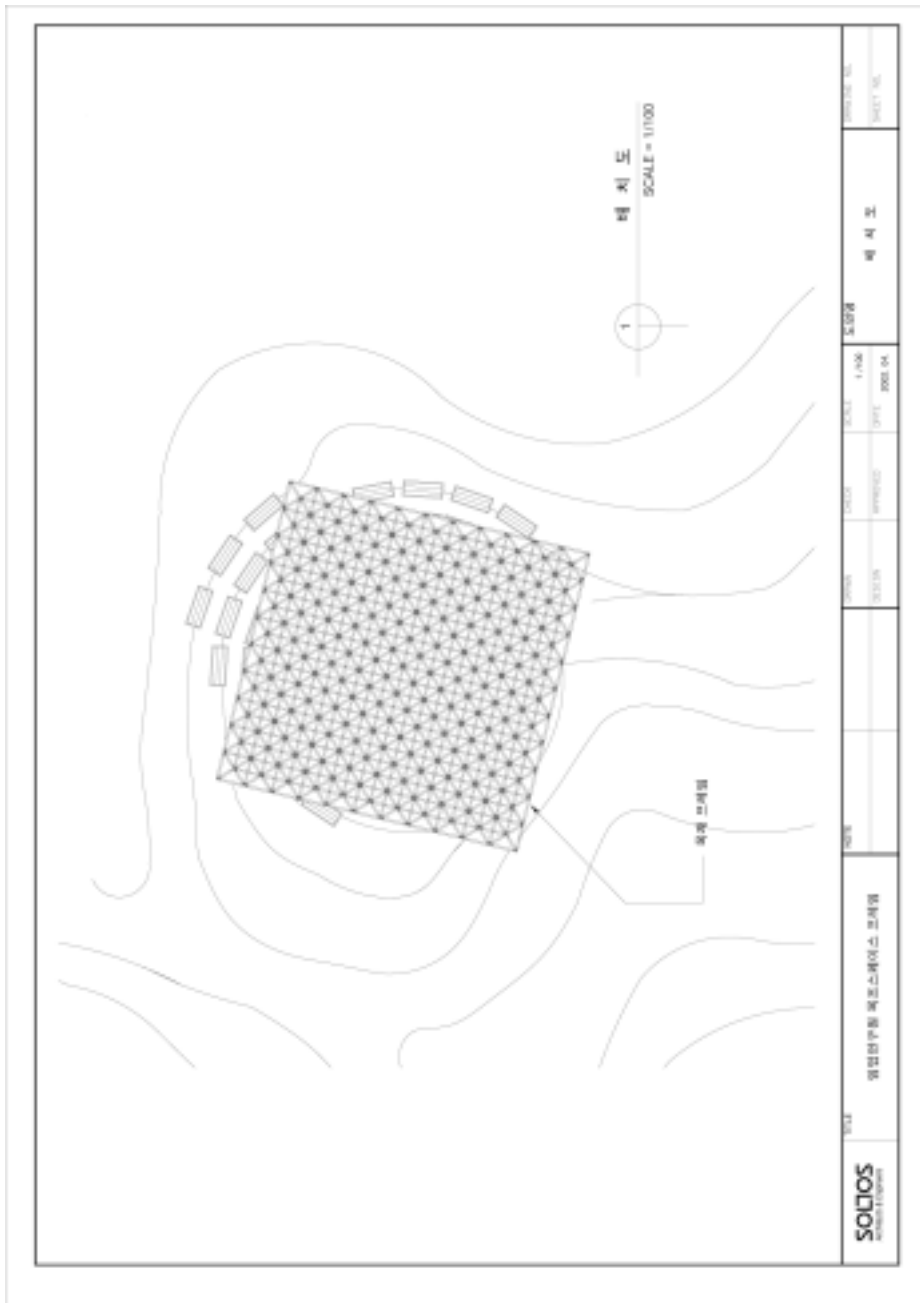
Plan of wood space truss structures constructed in Jungbu Forest Experiment Station
